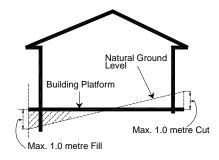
Cross section of cut and fill on a residential site.
